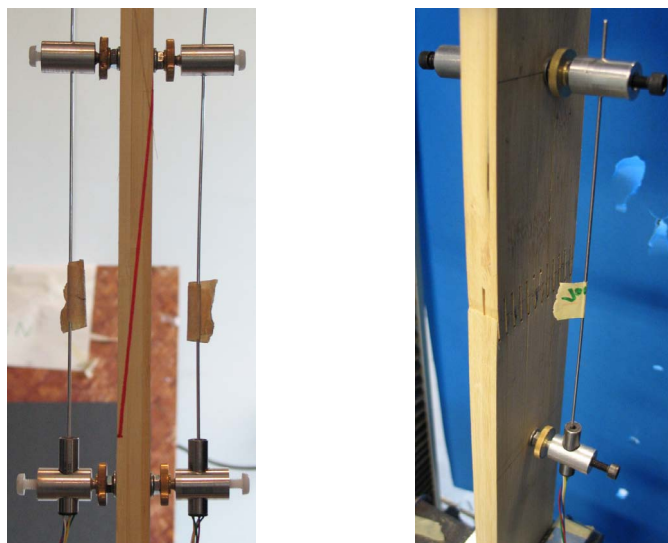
Left: positioning of LVDT-transducers mounted on scarf-jointed laminations; right: positioning of LVDT-transducers mounted on finger-jointed laminations
